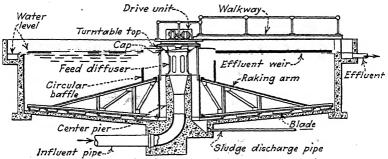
Assembly drawing (Dorr Sifeed Clarifier, center drive).
